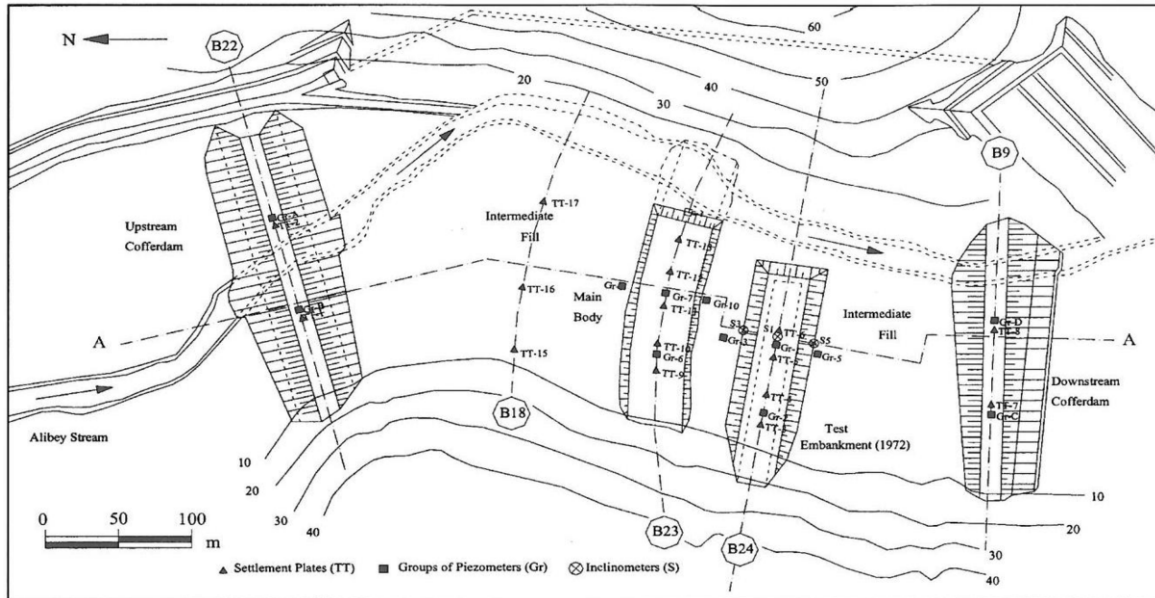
Plan view of Alibey dam (adapted from Ozcoban et al, 2007).
